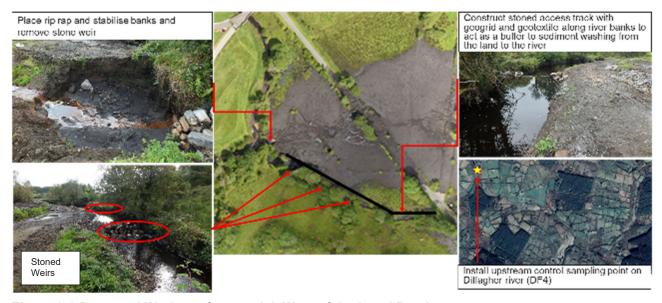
Proposed Works at Corcormick West of the Local Road
